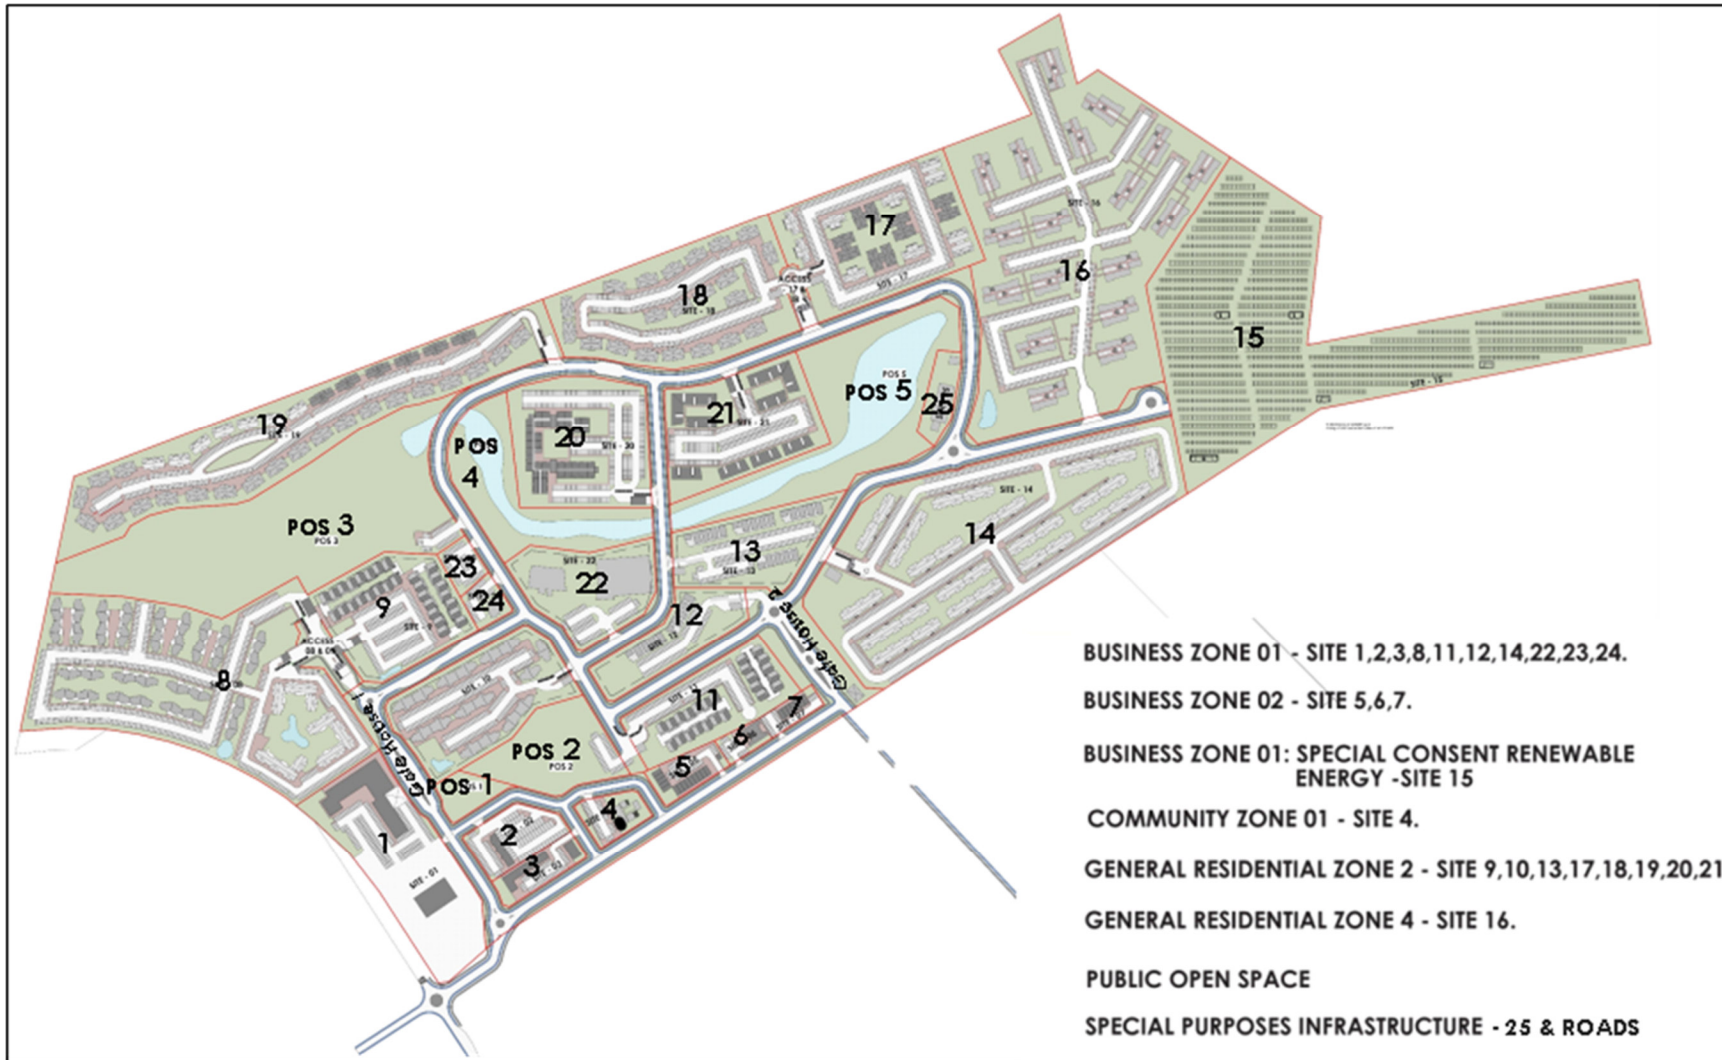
Proposed Arlington Multipurpose Development layout and zoning plan (source, JG Afrika (Pty) Ltd)
